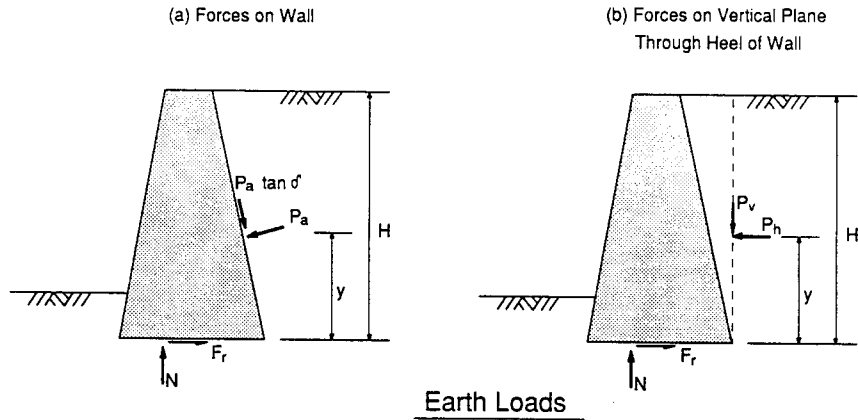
Earth loads and stability criteria for walls with clayey soils in the backfill or foundation (from Duncan et al., 1990).
